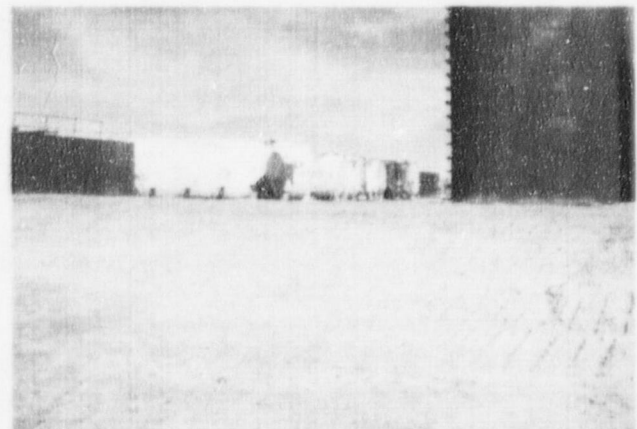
"Frac Tanks" Used for Temporary Water Storage On-Site
